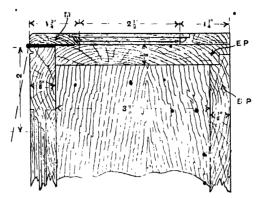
Part Horizontal Section of Wall-cupboard Bracket.
